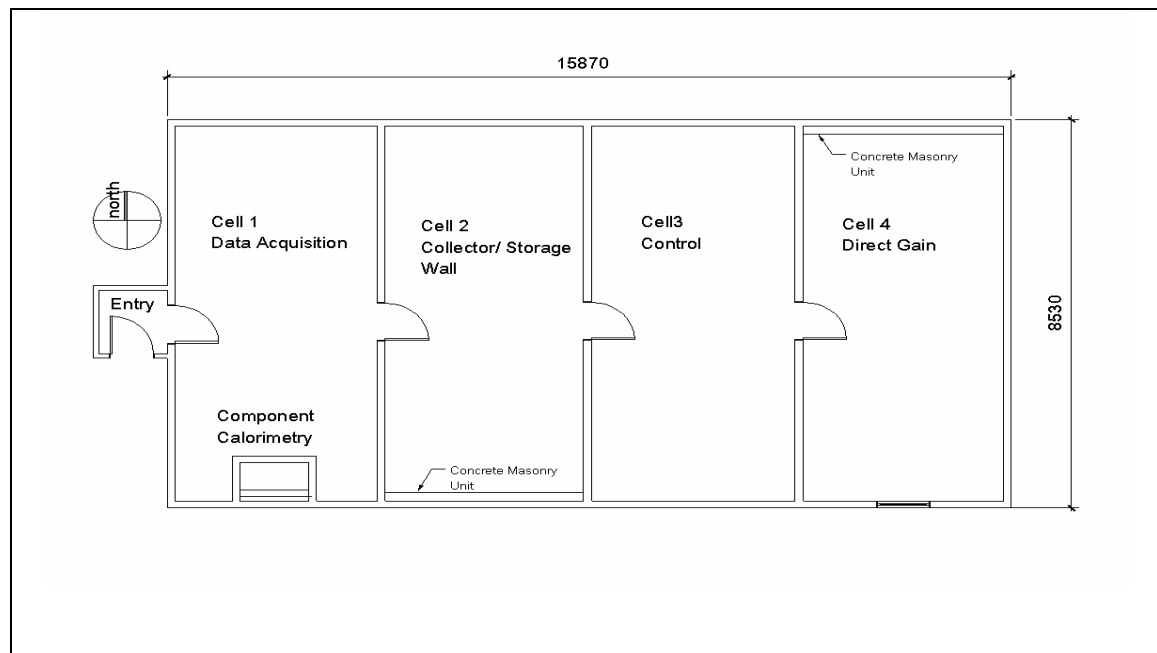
Floor plan of the NIST passive solar test building (Source: Eppel & Lomas 1992)
